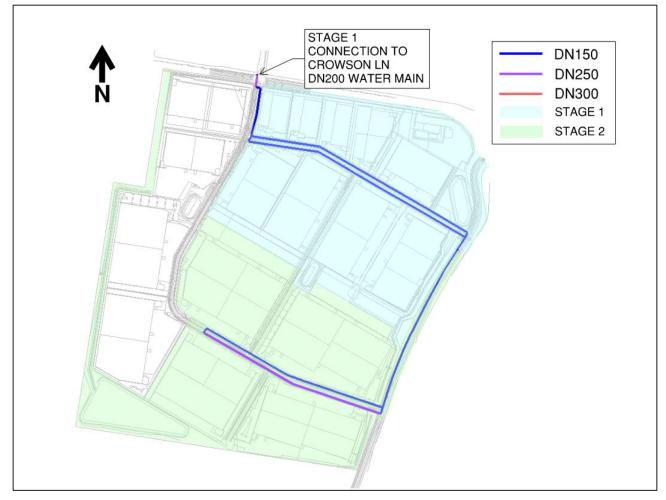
Alternative Supply Arrangement – Crowson Lane Only Internal Water Network Layout
